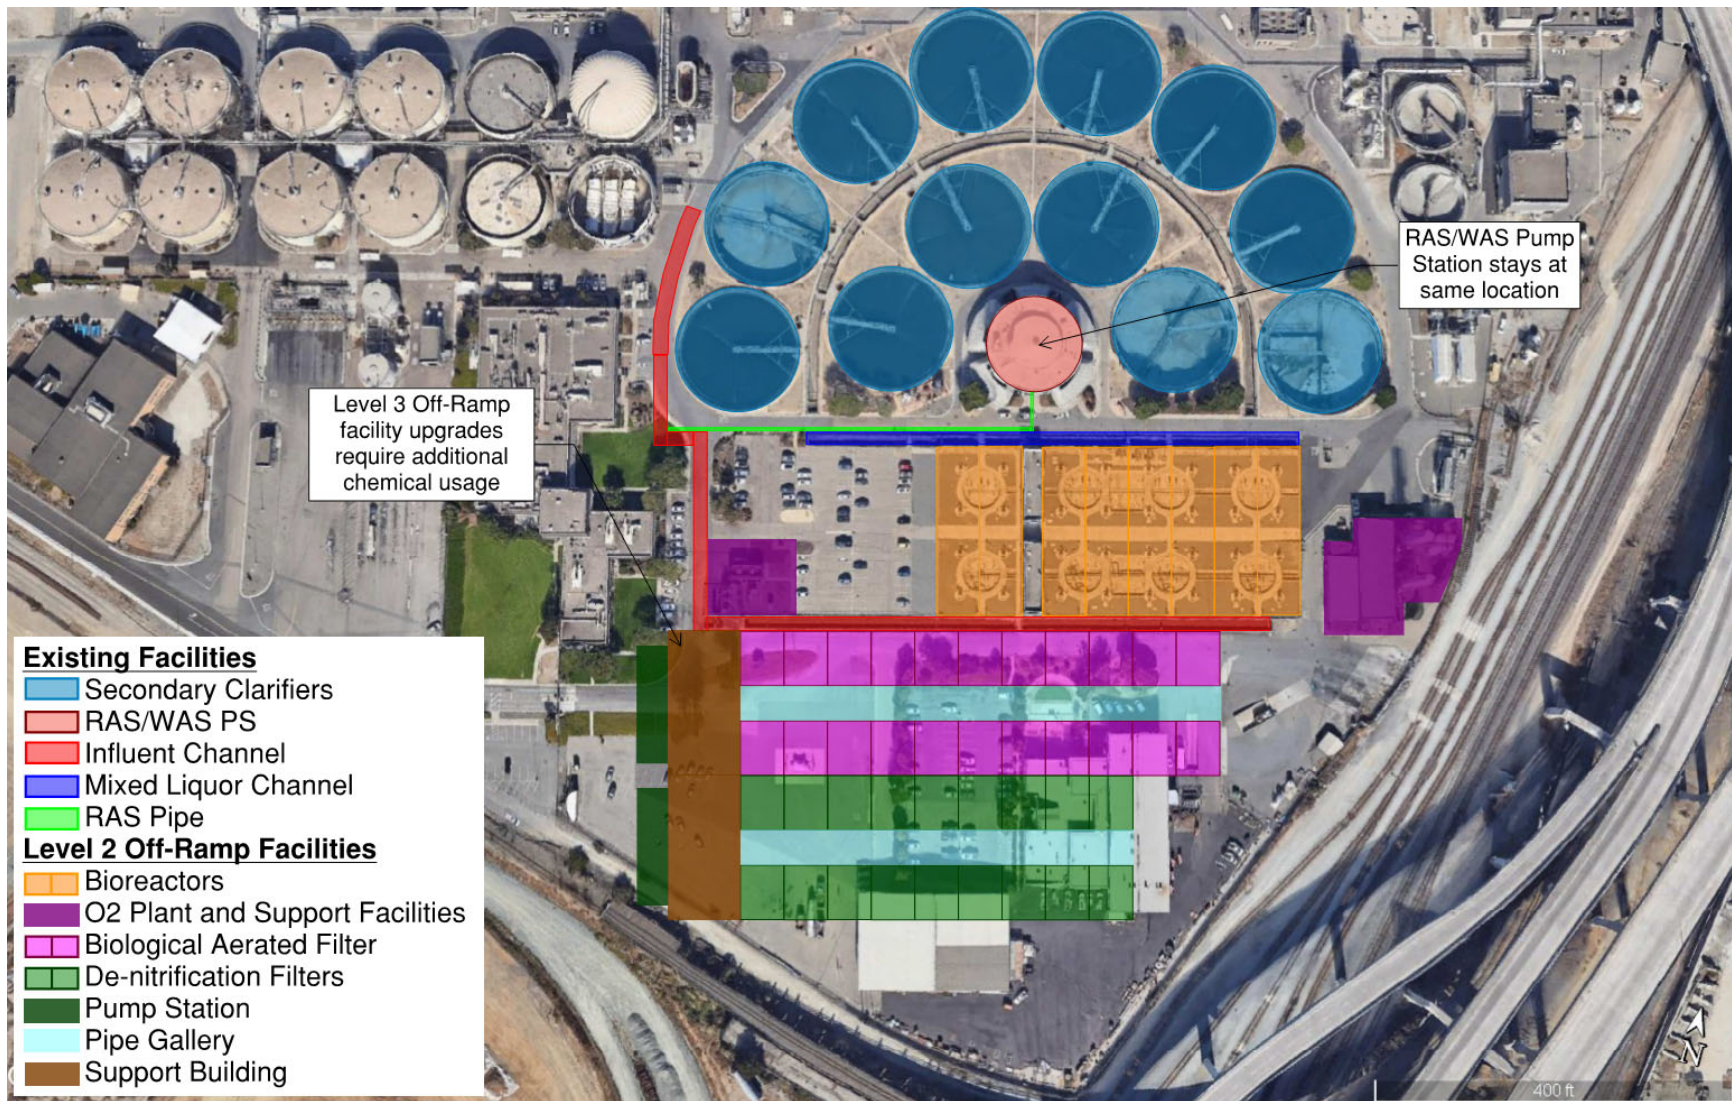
Alternative 1 HPOAS – Conceptual Site Layout
